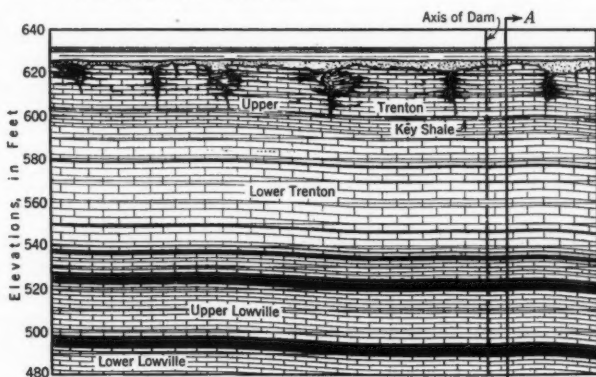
GEOLOGIC CROSS SECTION UNDER THE SPILLWAY, SHOWING
